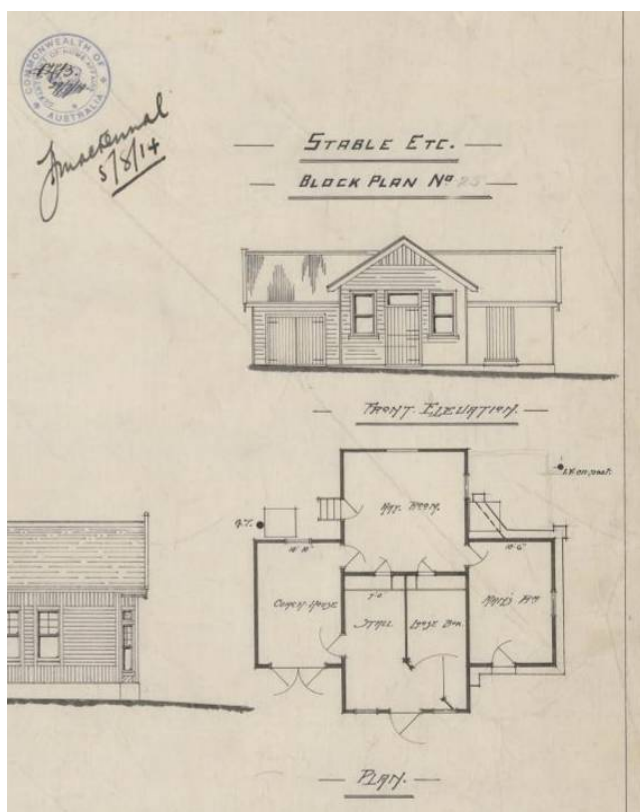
Existing conditions drawing of the subject building, dated 1914.
